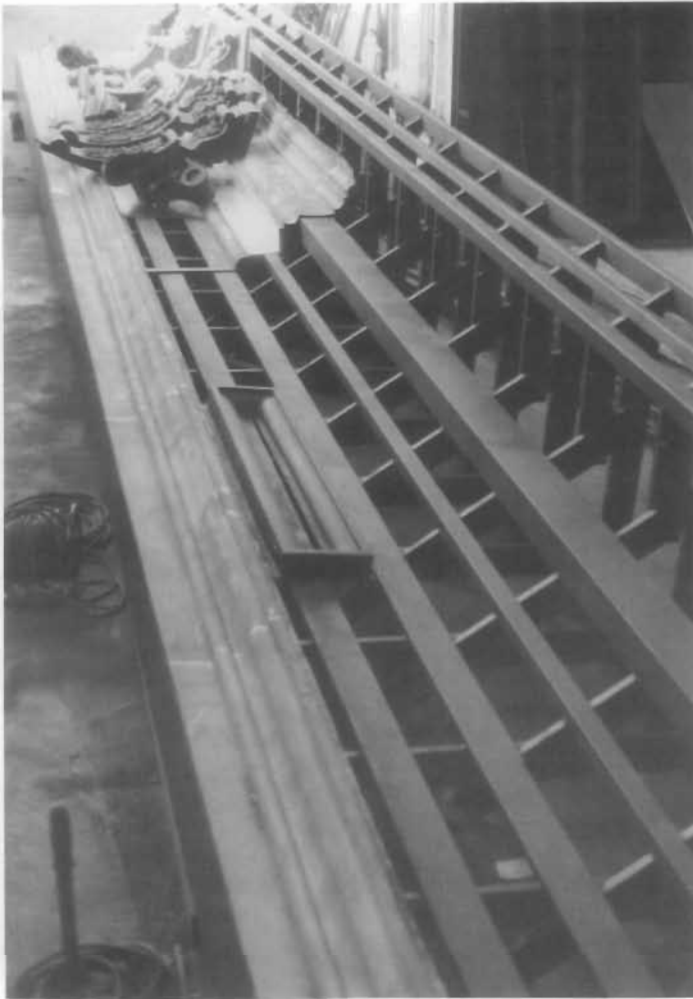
Preassembling Cornice. As illustrated in figure 142, most sheet-metal cornices were supported by wooden support members projecting out from the facade of the building either as an extension of the roof framing or as a cantilever from a parapet wall. In either case, these wooden support members are often found to be rotten and have to be replaced. For large cornices high above the street level, it may be economically unfeasible to use scaffolding for in situ repairs and reconstruction unless the scaffolding is also needed for other work. The entire galvanized sheet-iron cornice of the ZCMI Store in Salt Lake City, Utah, was preassembled on the ground with repaired original parts and some new pieces onto a new support system fabricated on small steel angles. Fifty-foot sections of the preassembled cornice were then hoisted to the top of the facade and bolted onto the building without the need for scaffolding. (Steven T. Baird)
